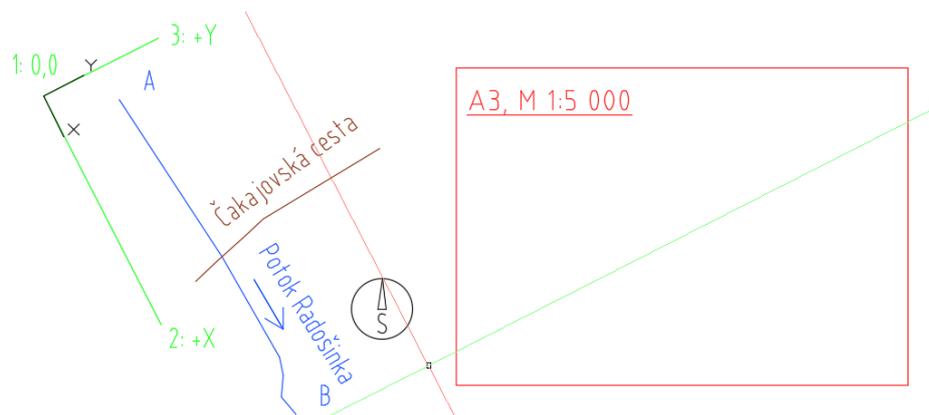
Drawing with the new coordinate system without the setting of a view perpendicular to the plane of the floor plan
